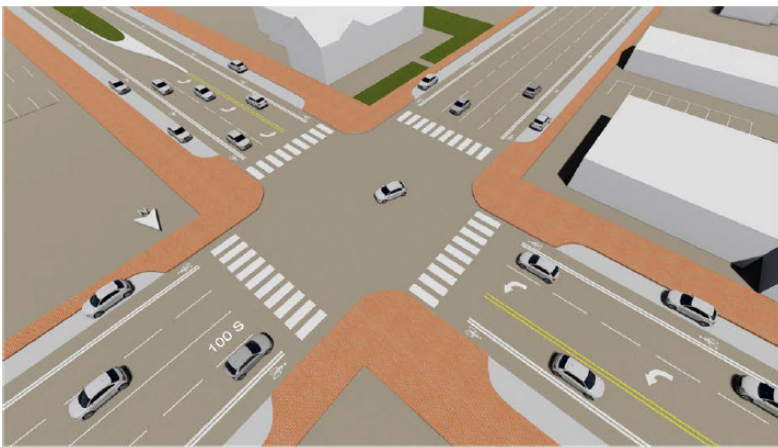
General Plan conceptual renderings of streets in the Vernal Avenue area.
